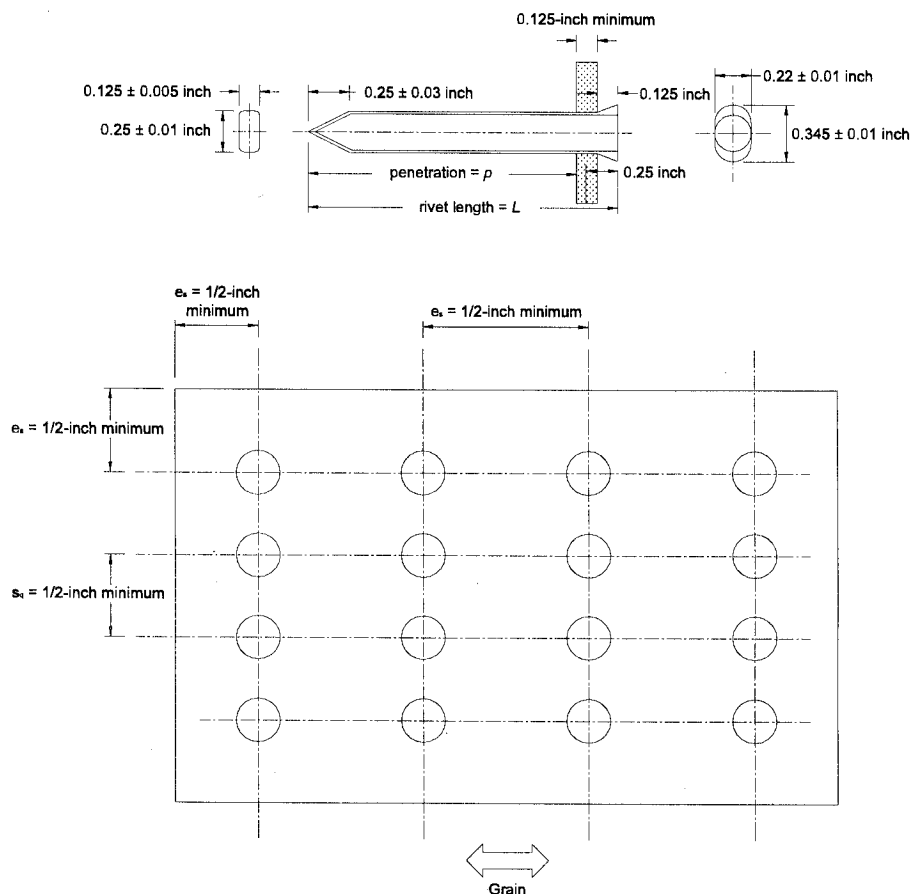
Timber rivet and steel side plate (AF&PA 1997).
